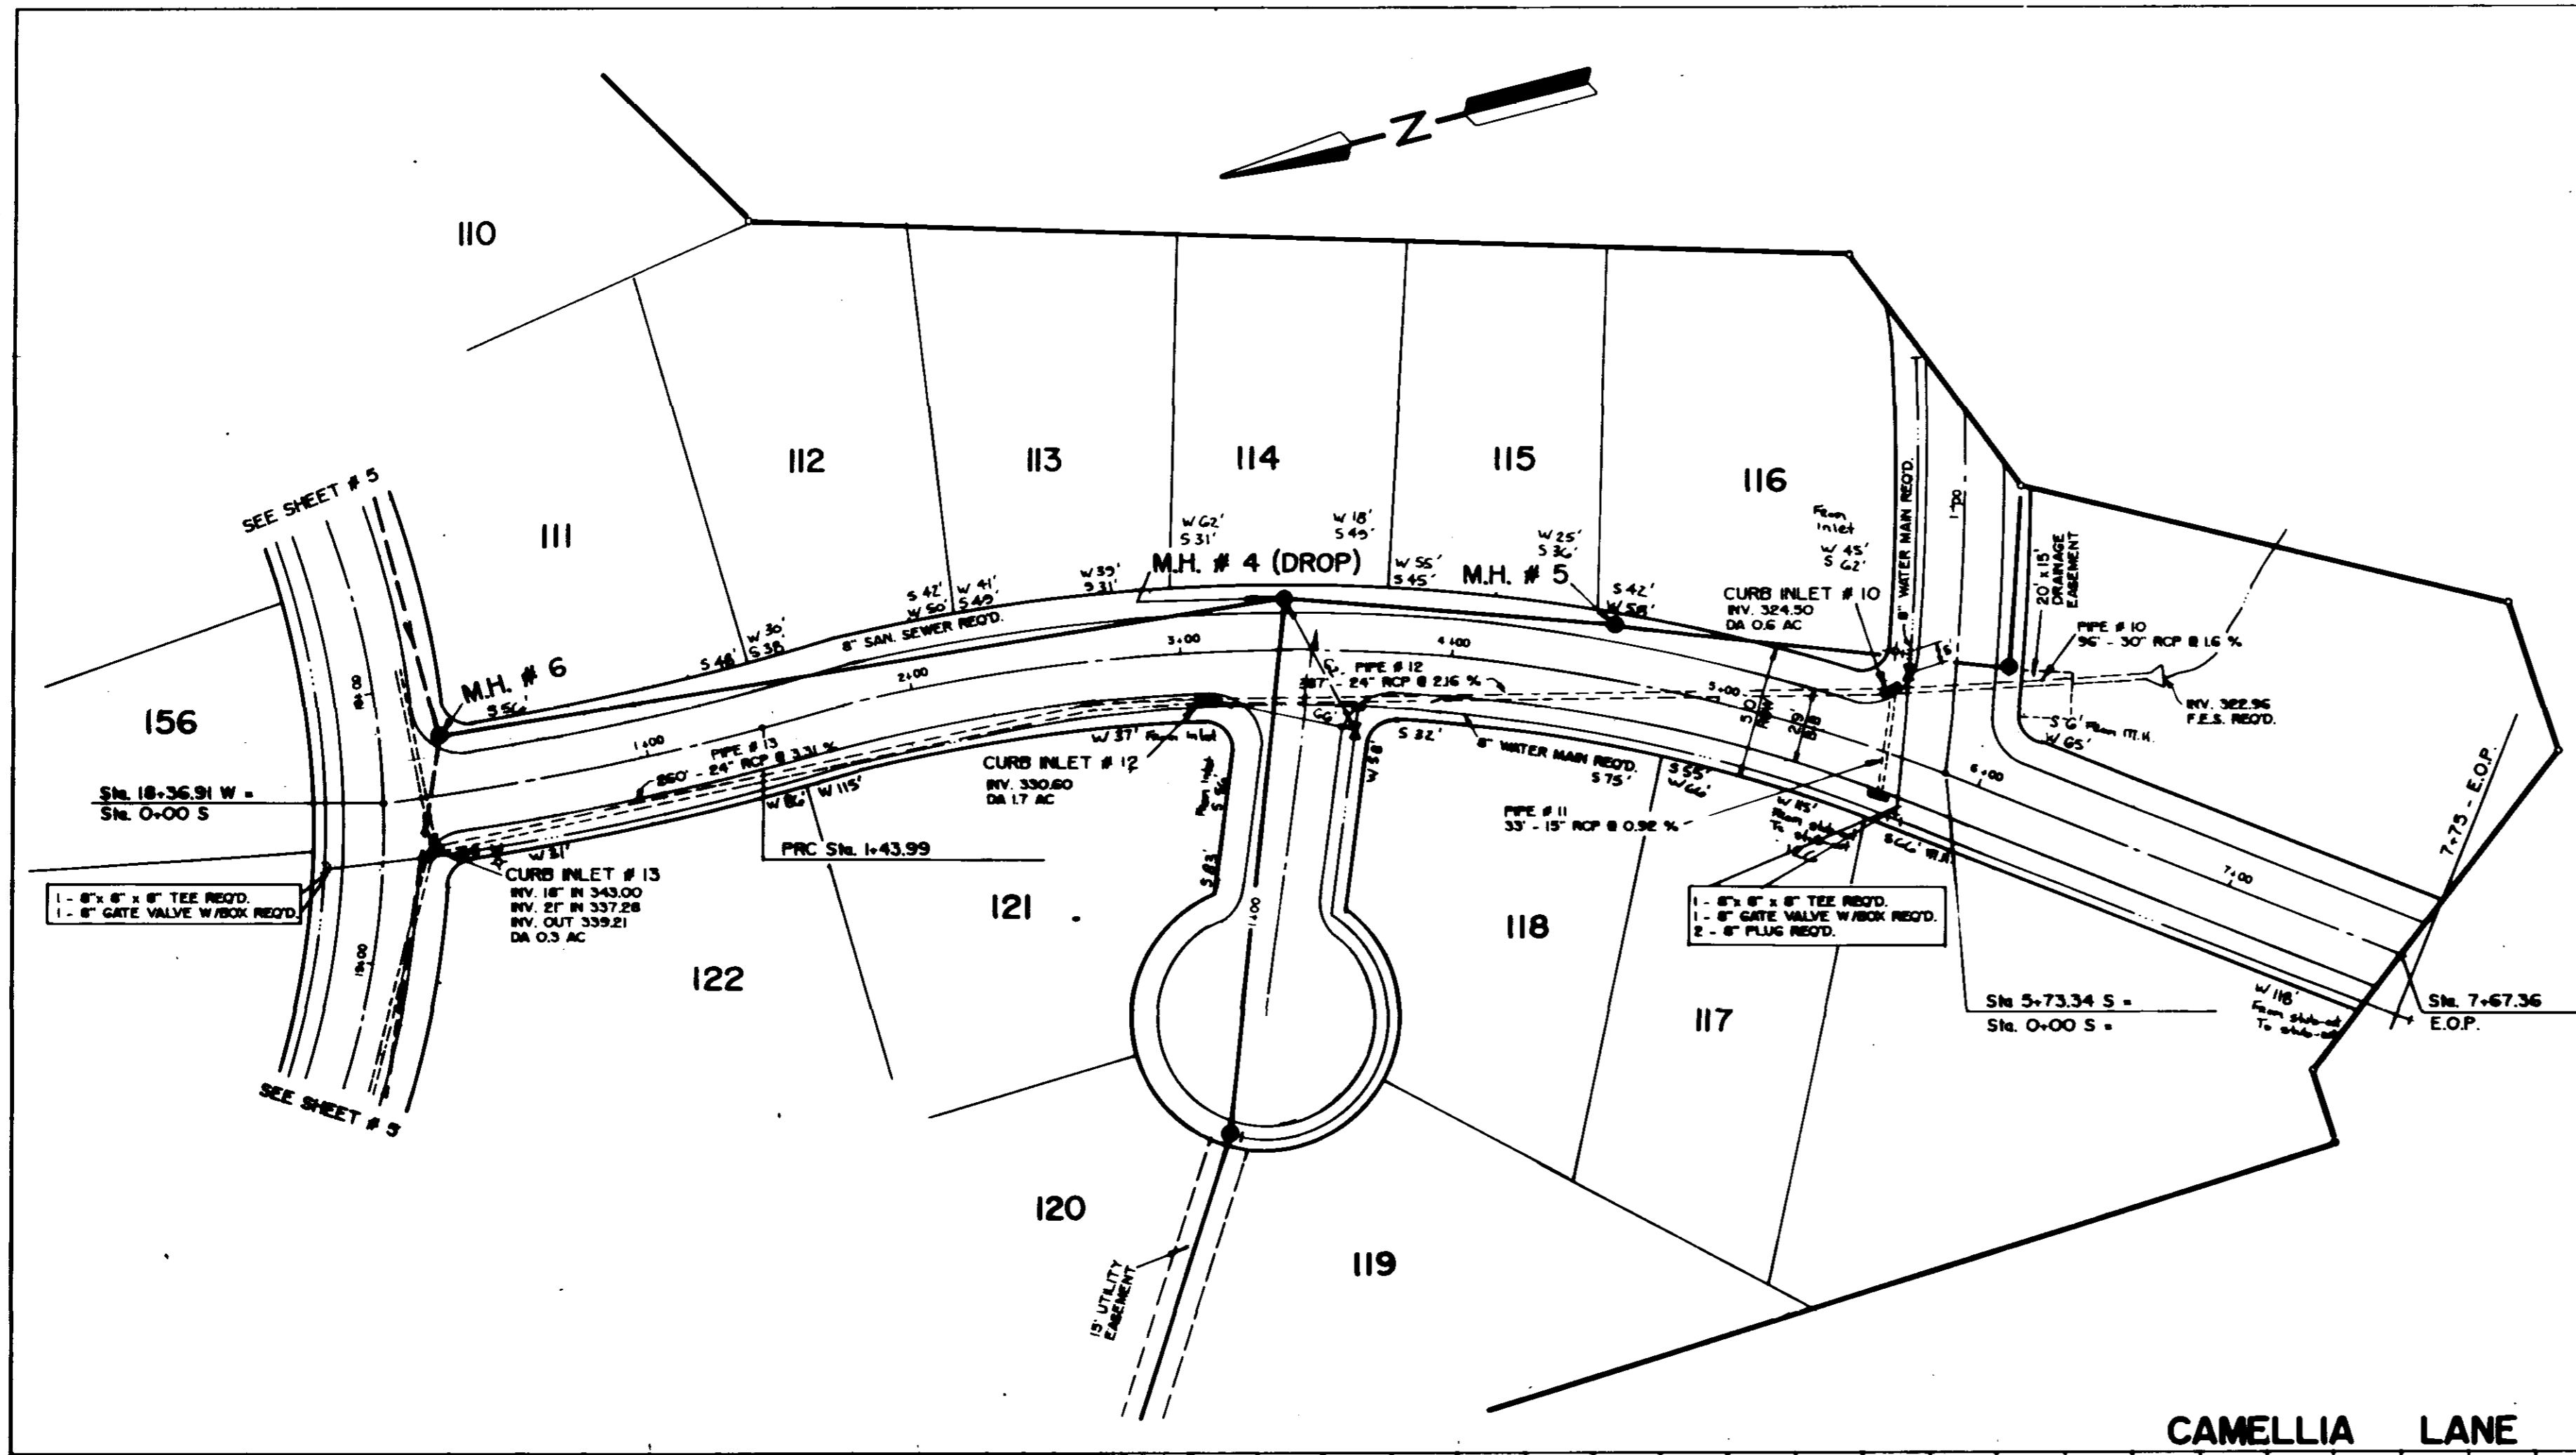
SINGLE PLAN AND PROFILE-FULL LINE
